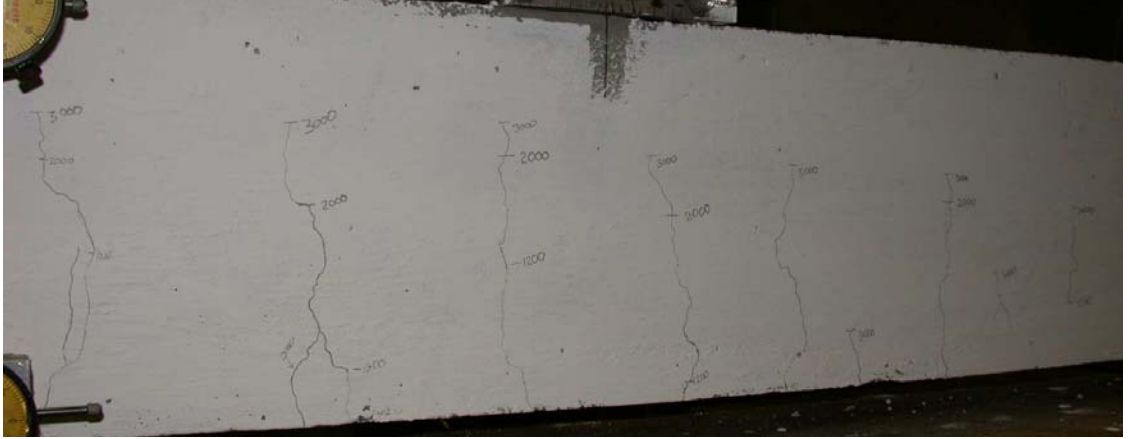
Beam P-2 Cracking at 3000 lb.
